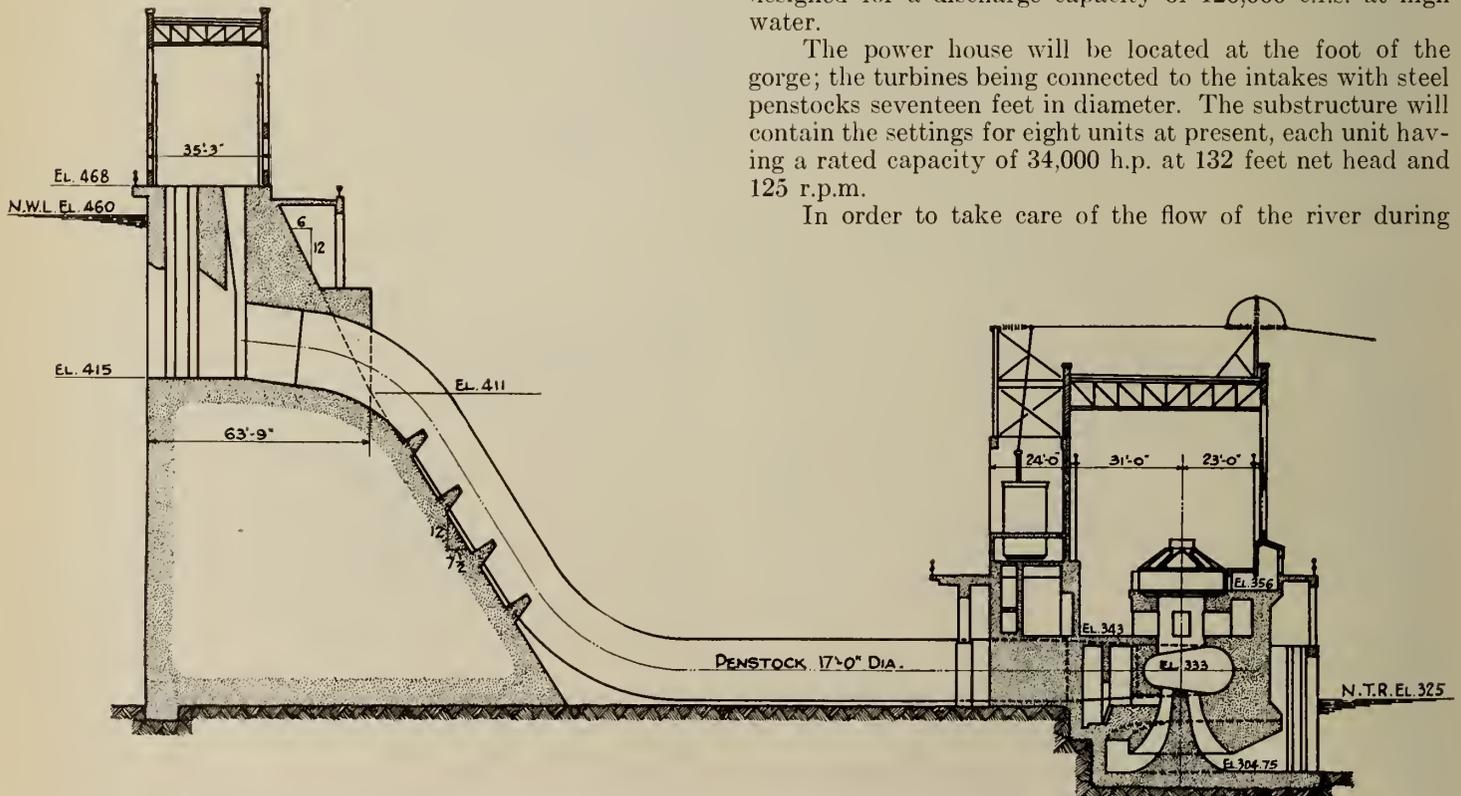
Paugan Development—Typical Section Through Headworks and Power House.
